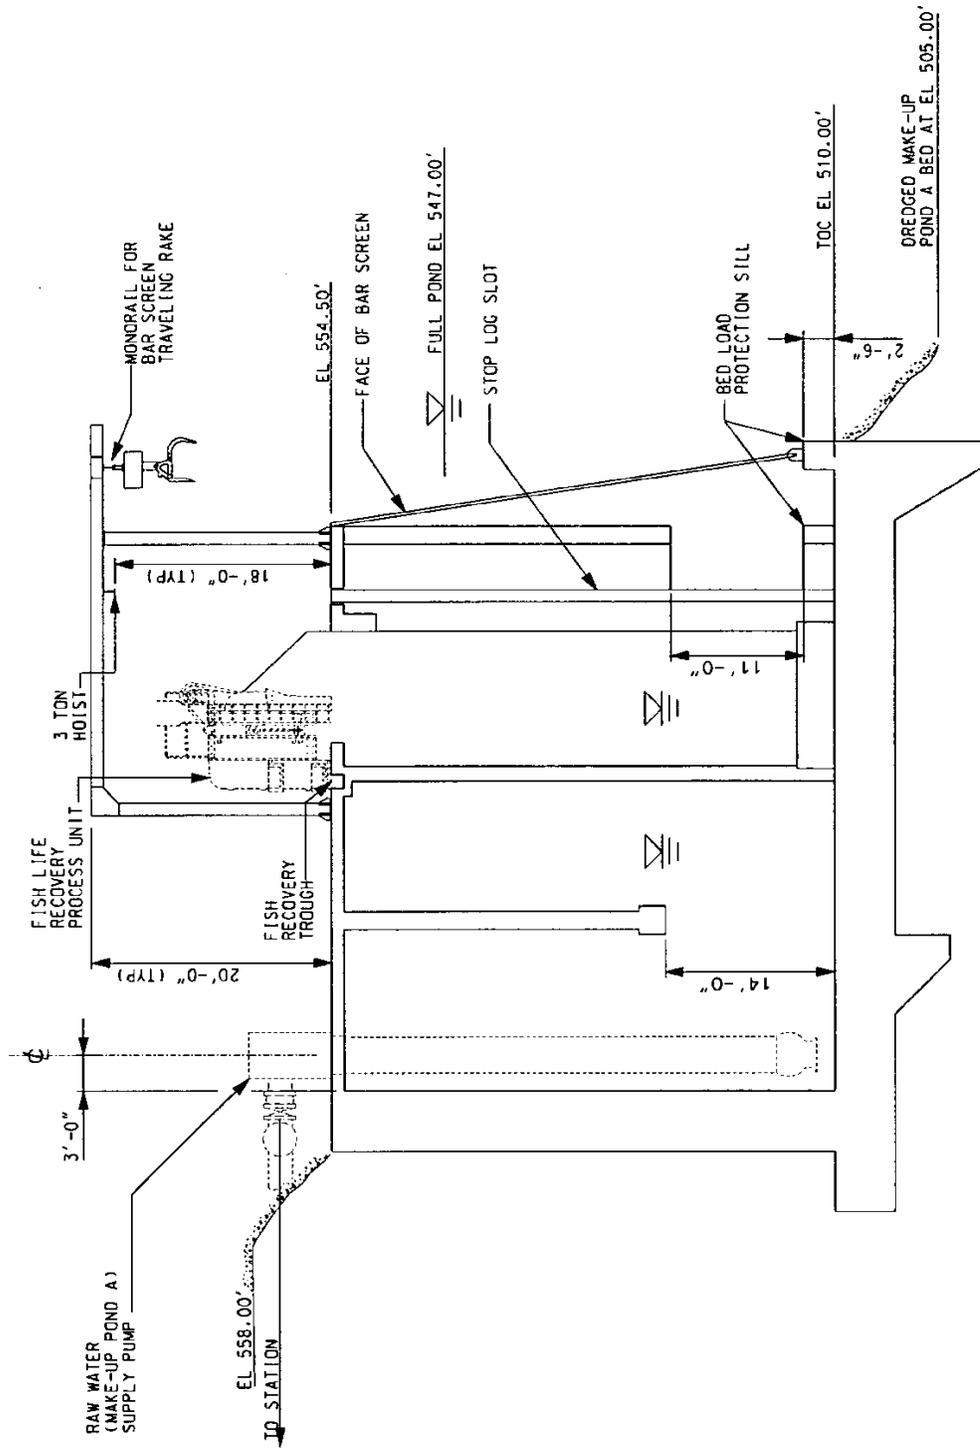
Cross-Section View of the Make-Up Pond A Intake Structure (Duke 2011d)
